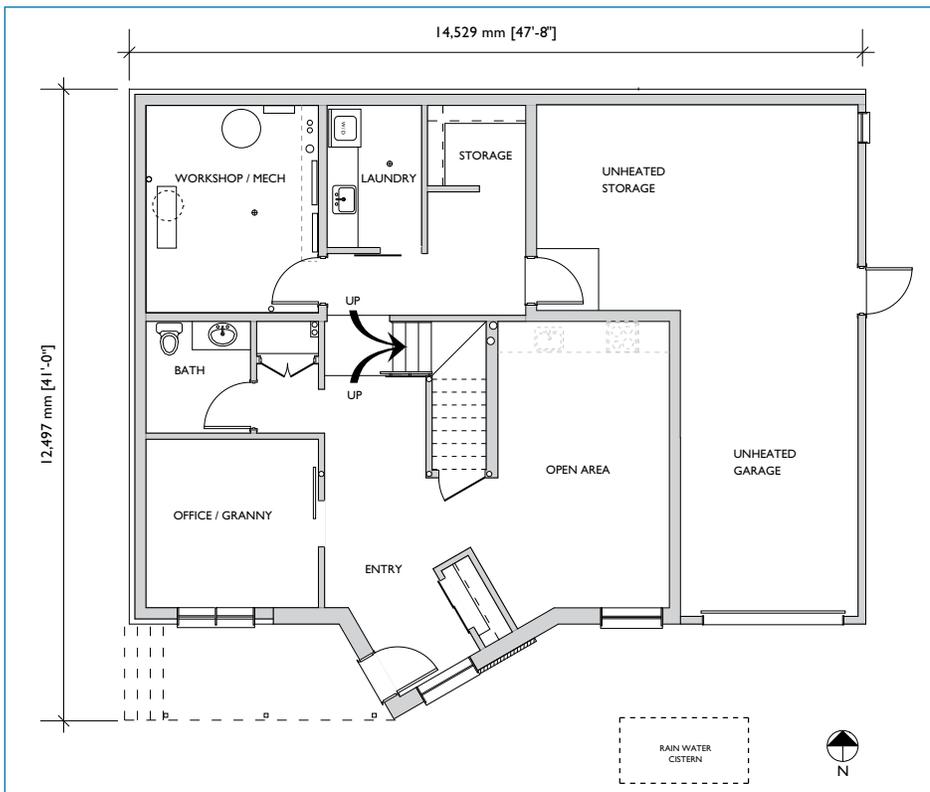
Lower floor plan of the EchoHaven EQUilibrium™ Project
